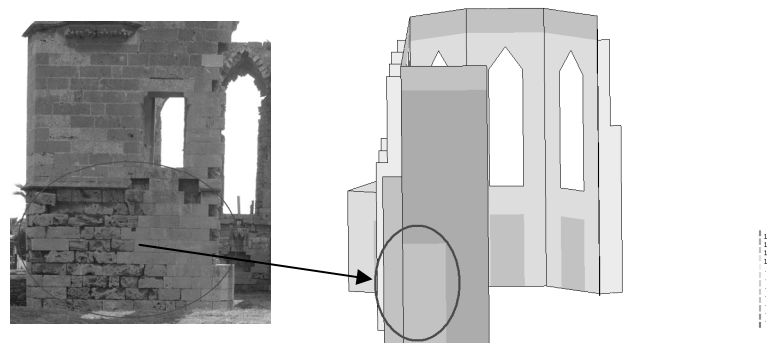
Damaged region in west façade due to loss of elements and severe stone deterioration
